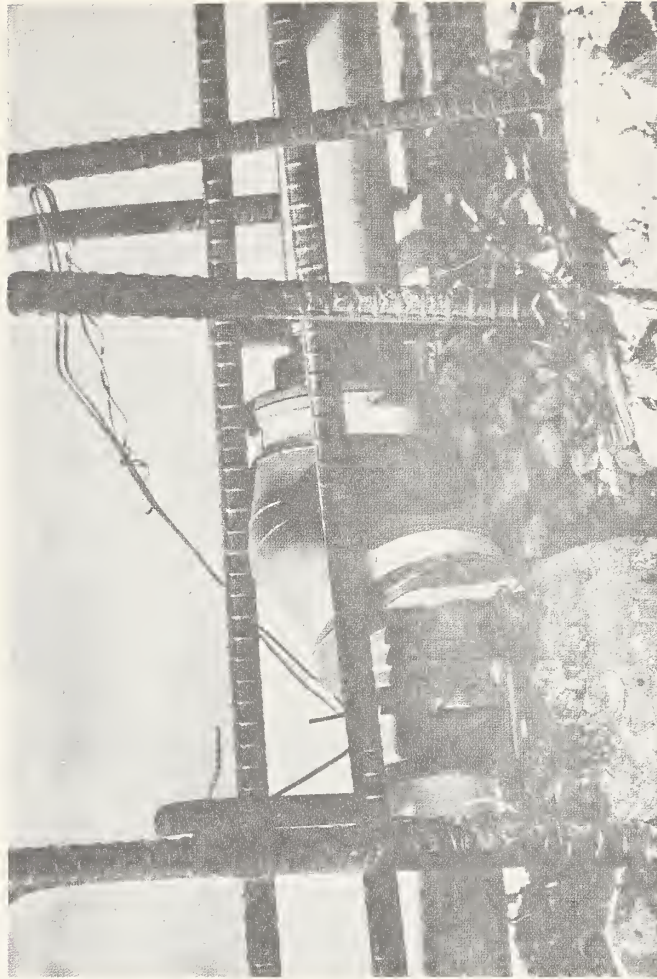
Buckled flexible splice in steel conduit - Santa Clara Overhead Crossing on State Highway 14
